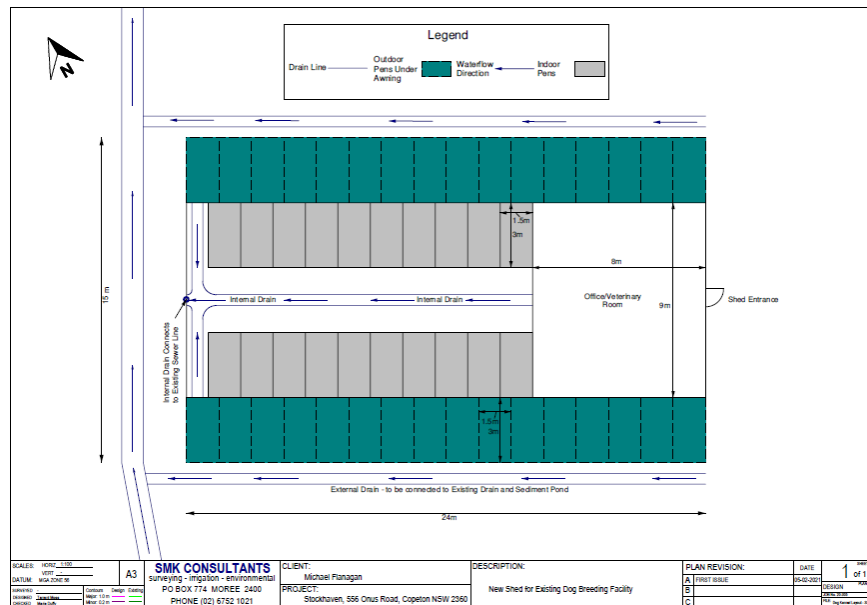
New Shed for Existing Dog Breeding Facility - Dog Kennel Layout
